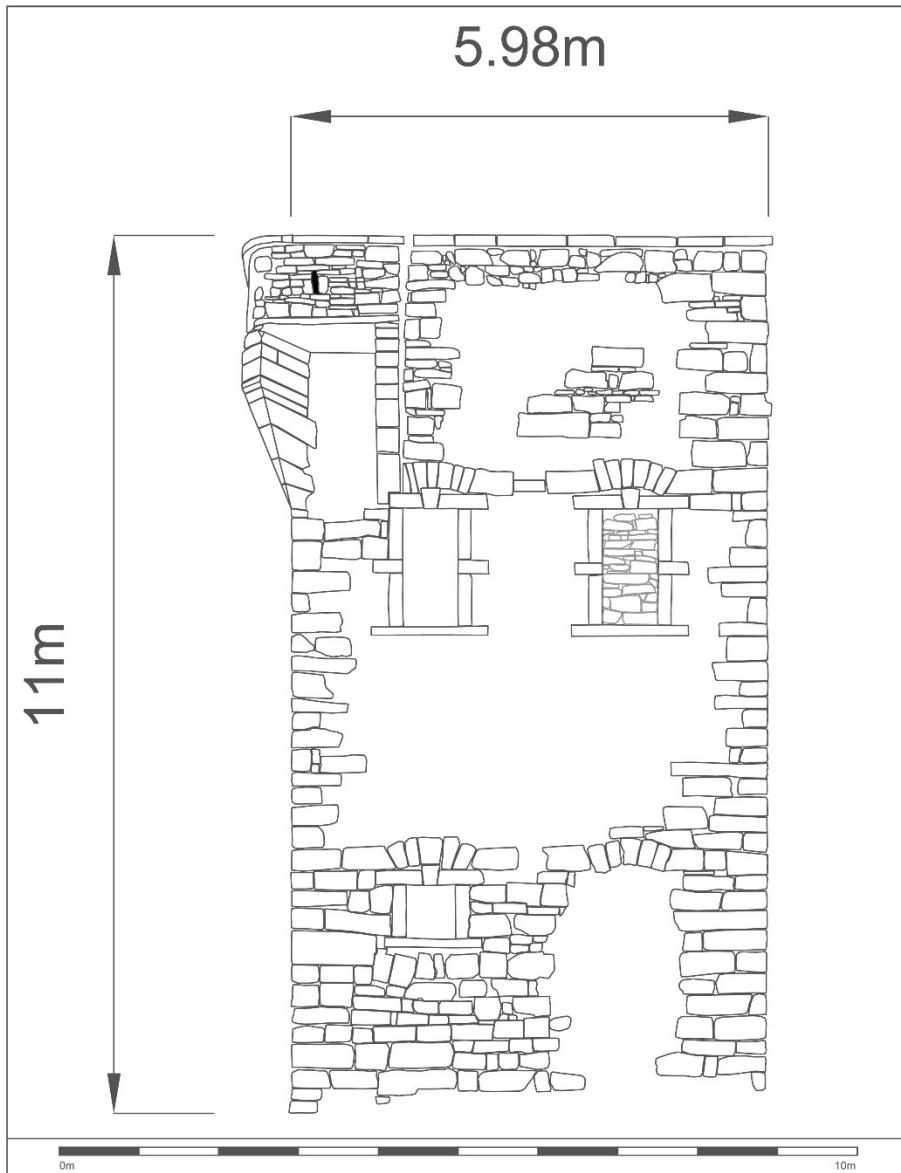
External elevation of the east wall of the signal tower at Carrowmably Signal Station. The gun-loop on the east wall of the south-east bartizan is shaded black.
